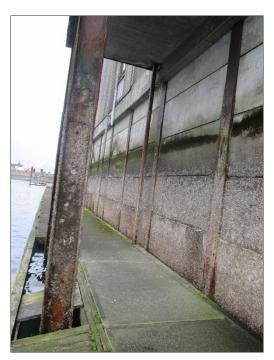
Concrete lagging existing conditions (There are surface effects from water; however, the overall visual inspection seemed acceptable at this point.)
